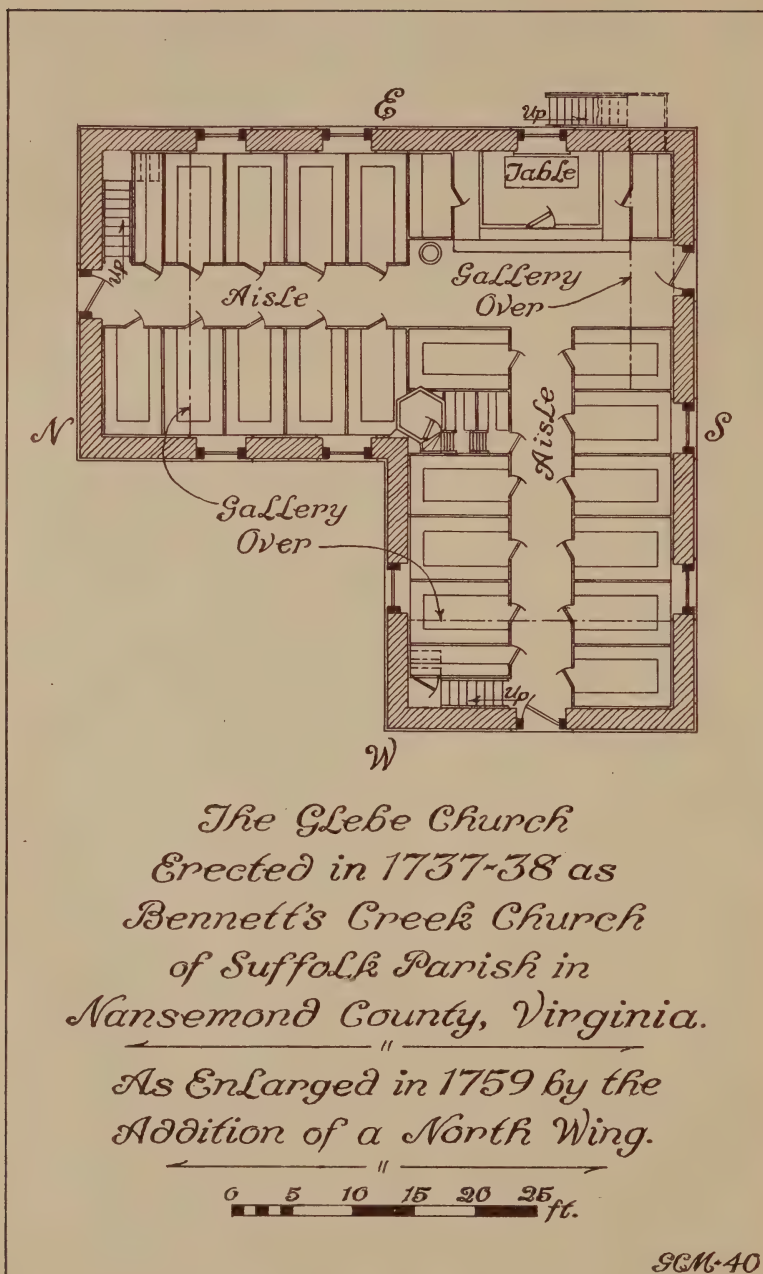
Bennett's Creek Church in 1759, interior arrangement.
